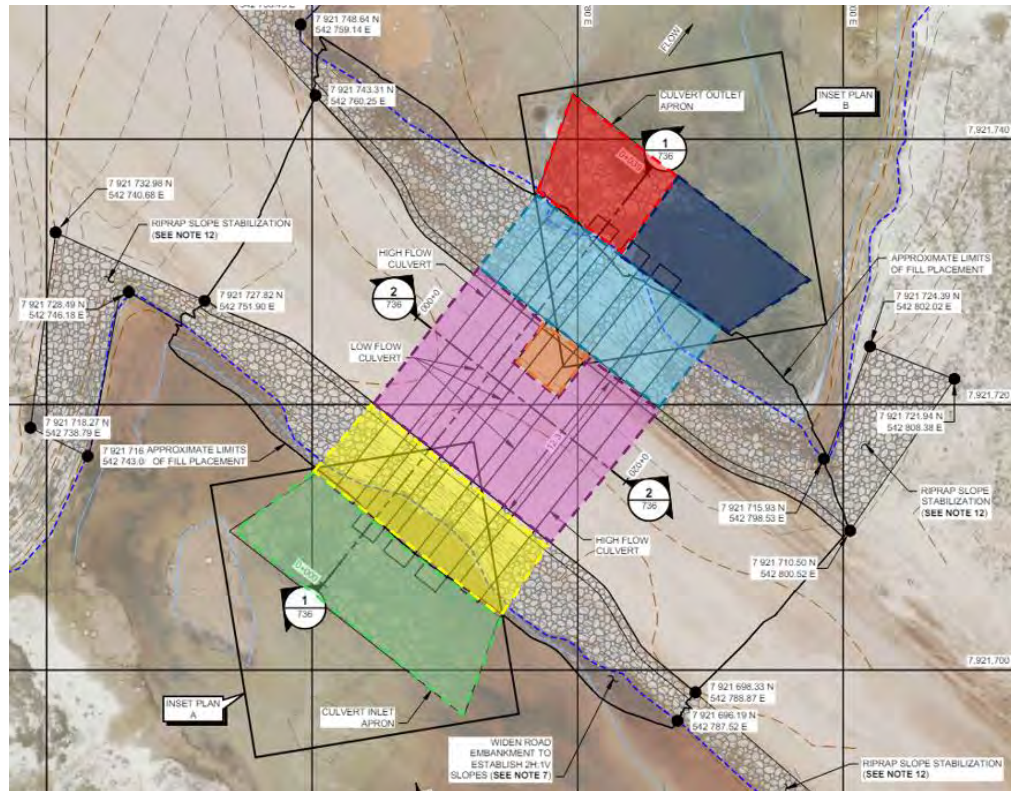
Approximate foundation acceptance area FND-01, plan view. Section 1 highlighted in green, Section 2 highlighted in yellow, Section 3 highlighted in purple, Section 4 highlighted in orange, Section 5 highlighted in light blue, Section 6 highlighted in red, Section 7 highlighted in navy.
